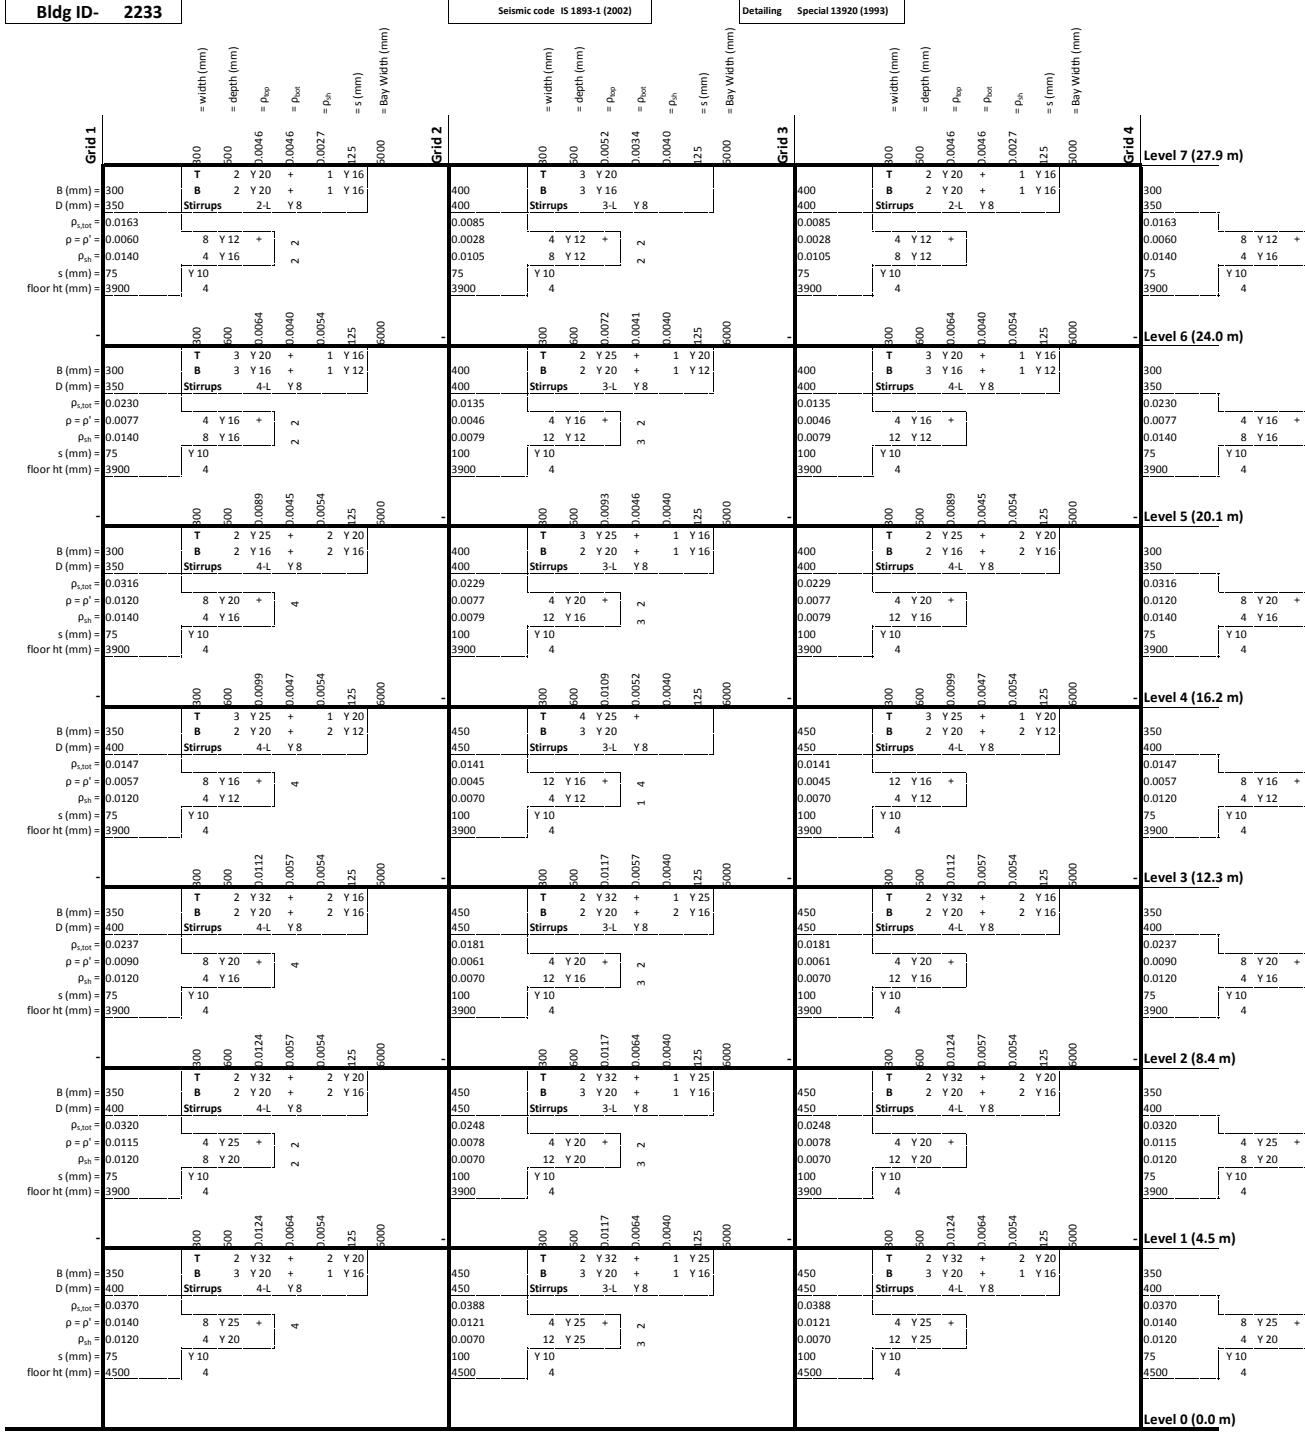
Provided reinforcement and modeling details for building ID 2233
